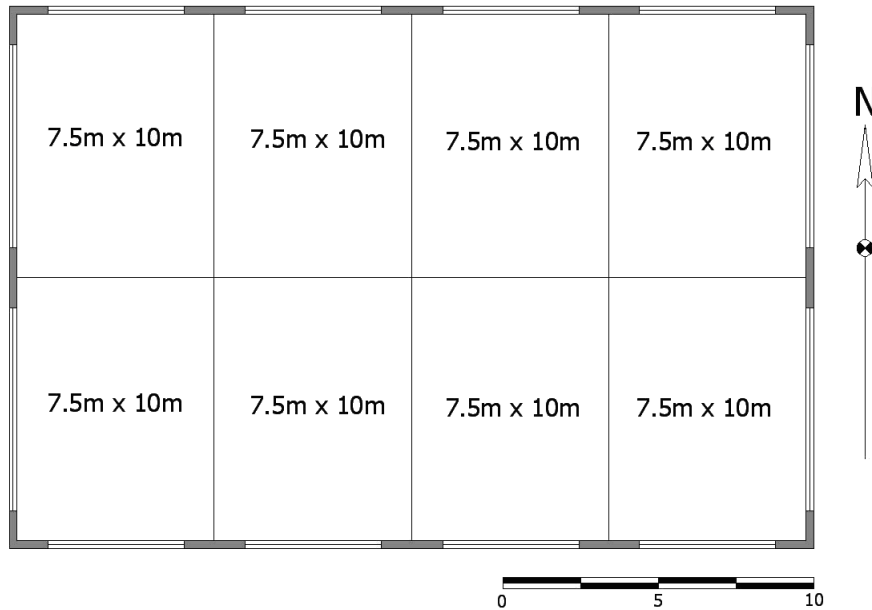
Layout of the windows and thermal zones in a floor of the office building.
